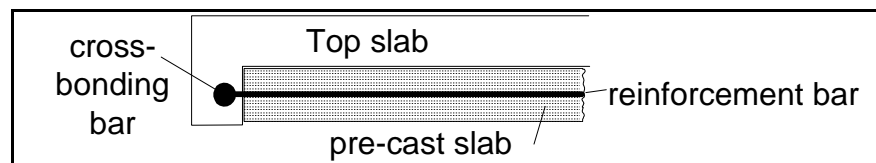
Example of Earthing Measures for Precast Slab
